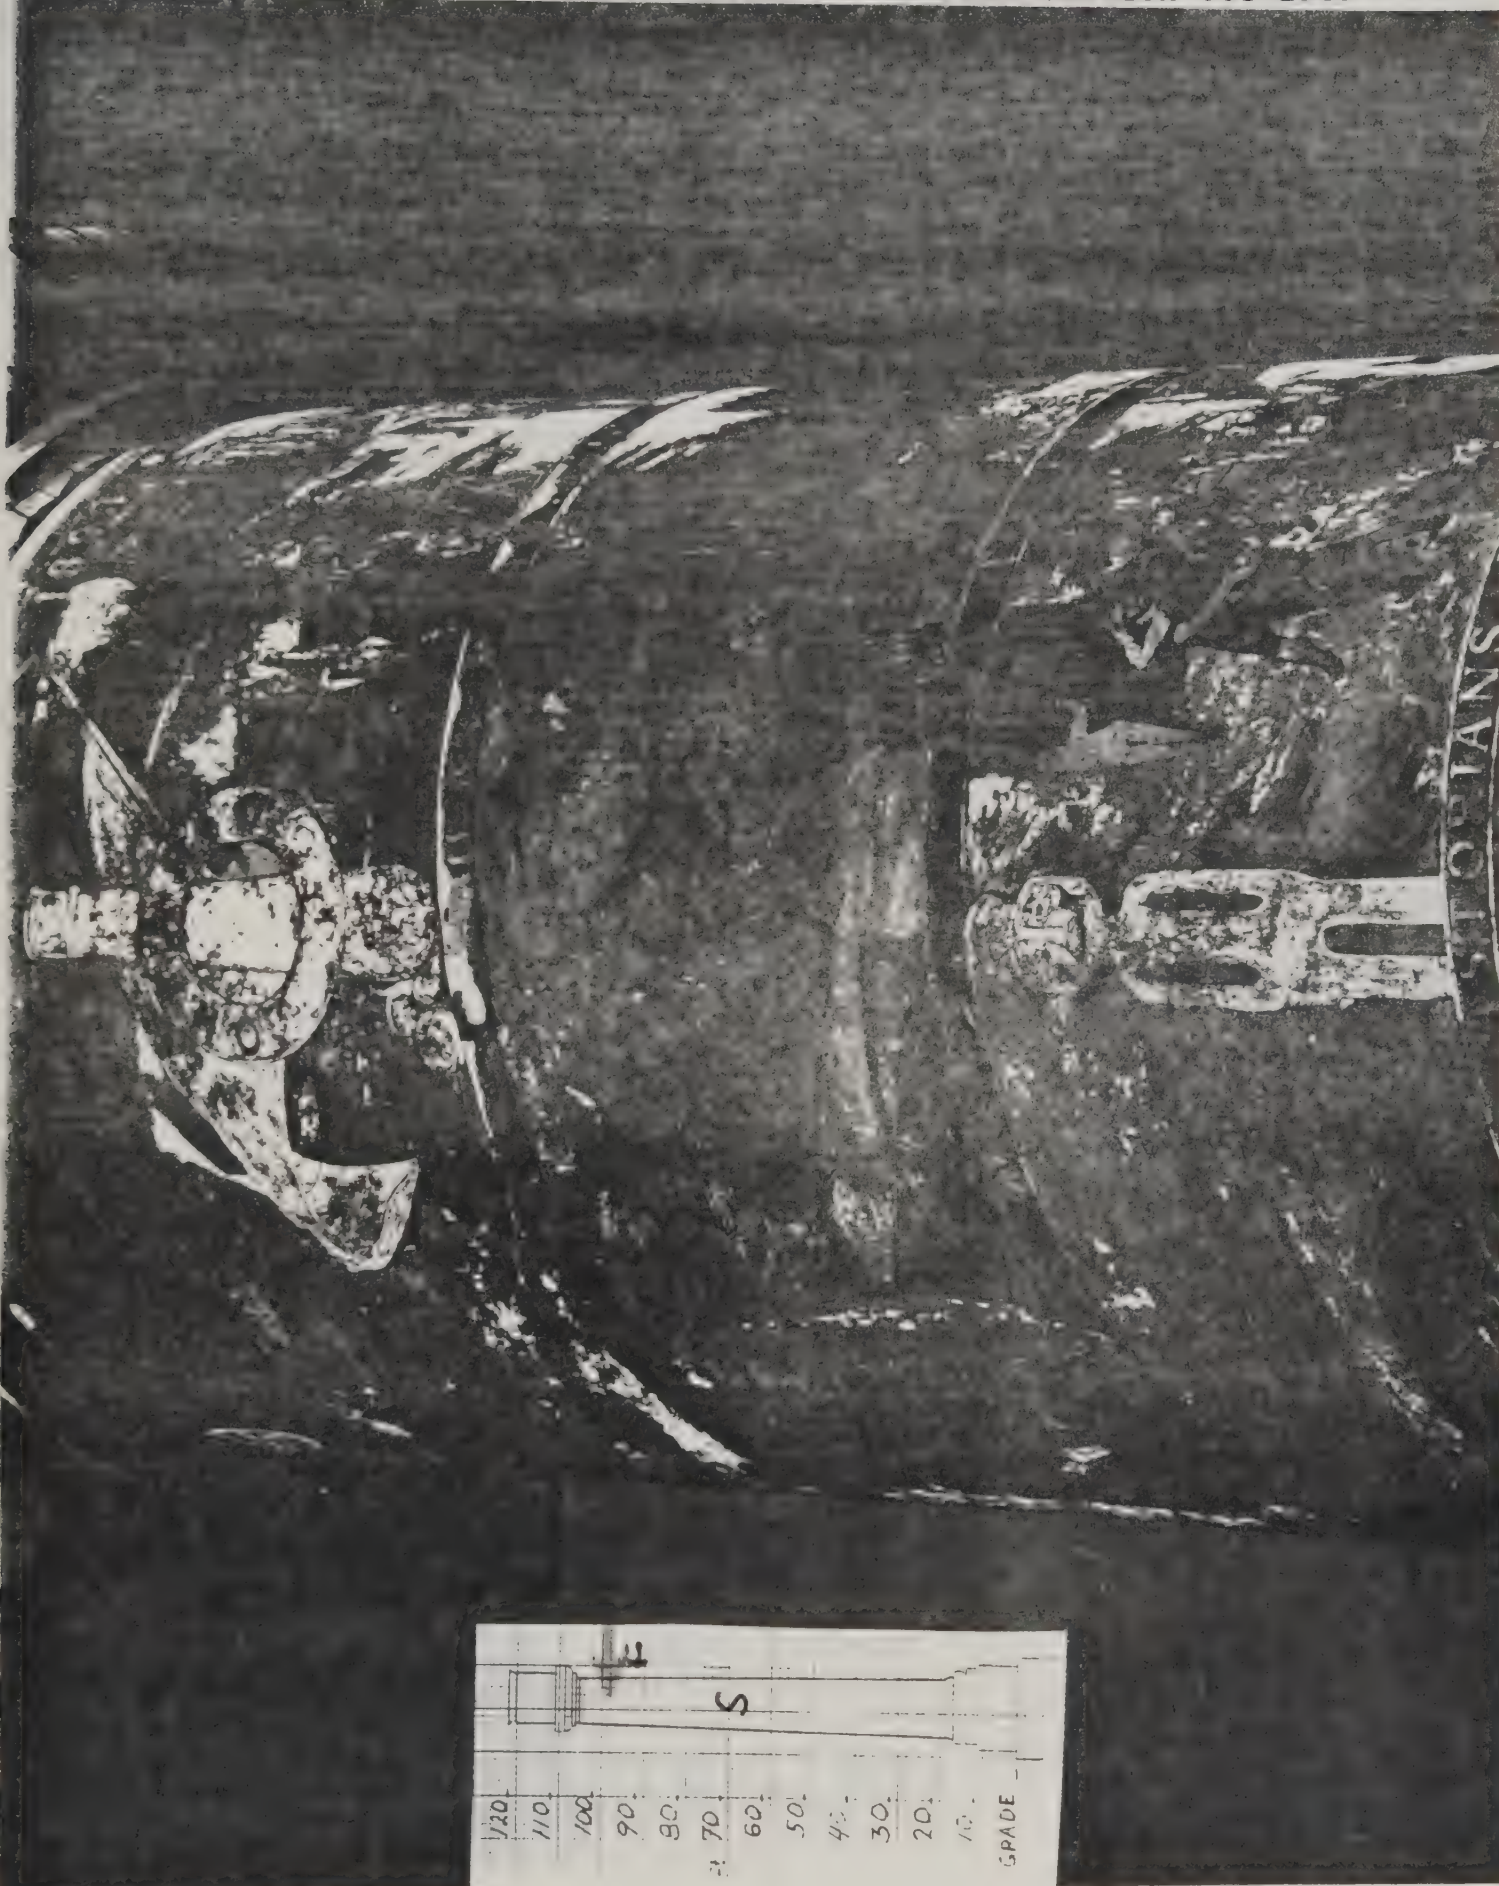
Photo Astoria Column South Face Section-OCT 1989
